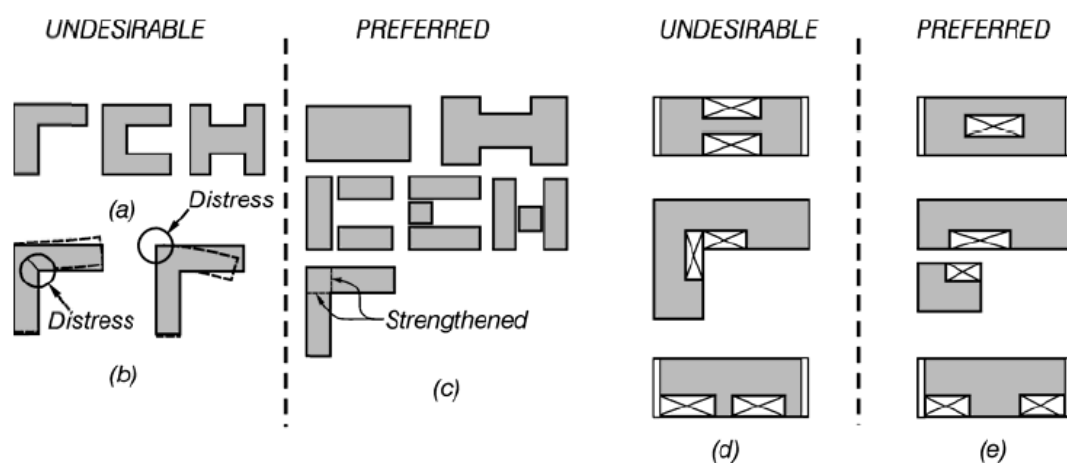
Plan configuration in buildings (Paulay and Priestley, 1992)
